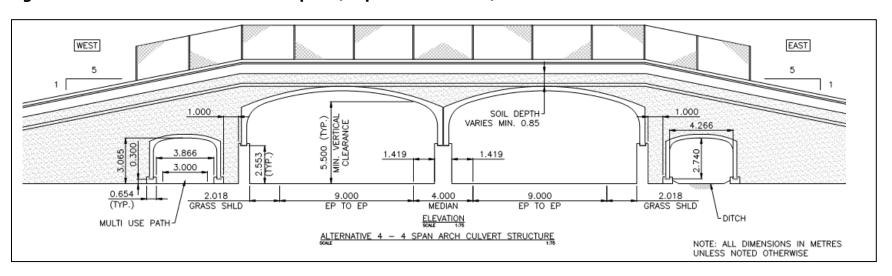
Alternative 4 - Wildlife Overpass (4 Span Arch Culvert) – Elevation View
